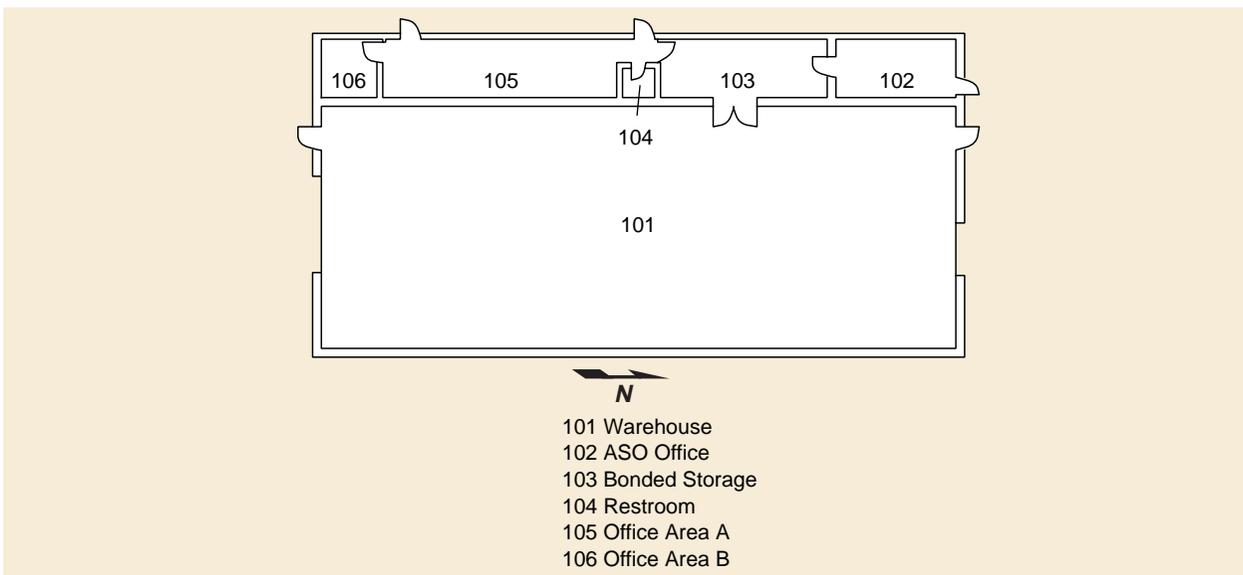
Building 4 Detailed Floor Plan, Astrotech
